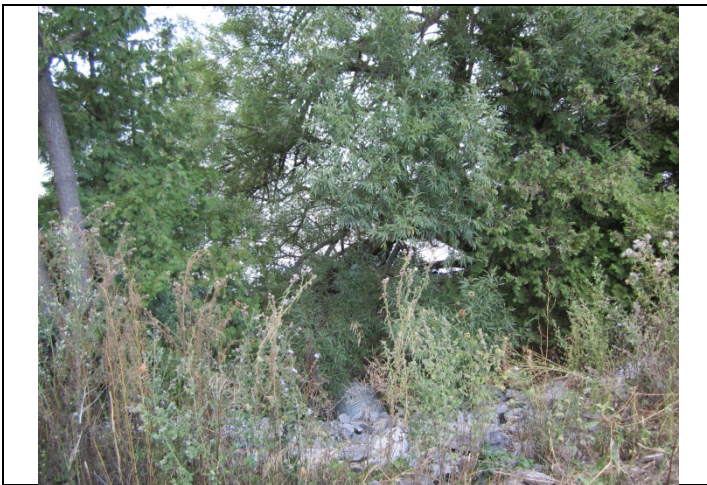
Station 57 – facing downstream from Front Road towards Lake Ontario
